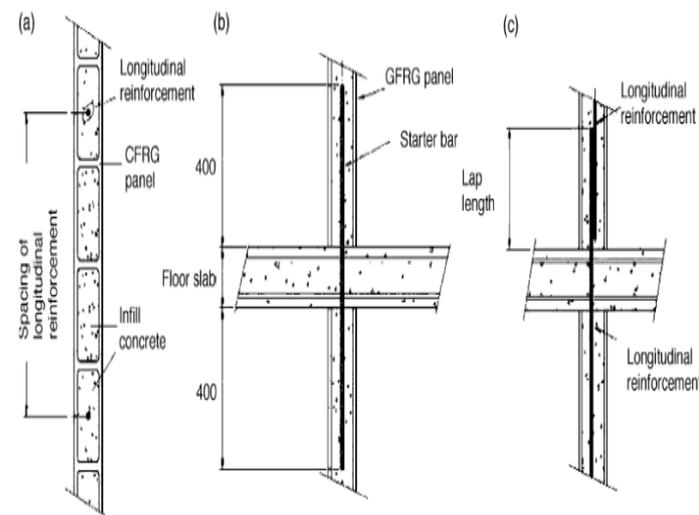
Connections between wall and floor. (a) plan, (b) vertical section of a starter bar connection, (c) vertical section of a continuous reinforcement.
